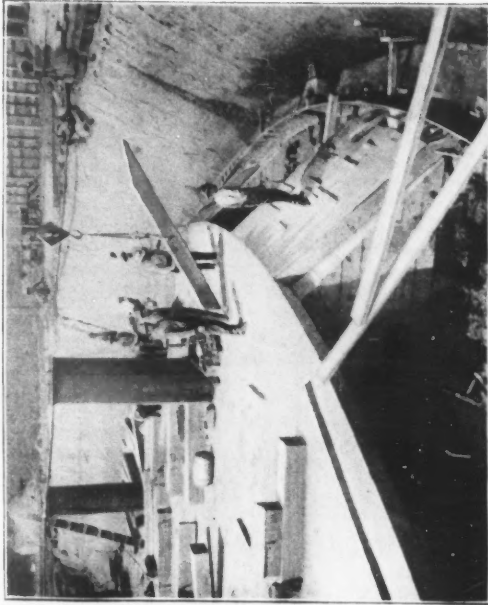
FIRST COURSE OF ROOF COMPLETED AND SOME STAVES AND AIR LOCKS IN PLACE.
